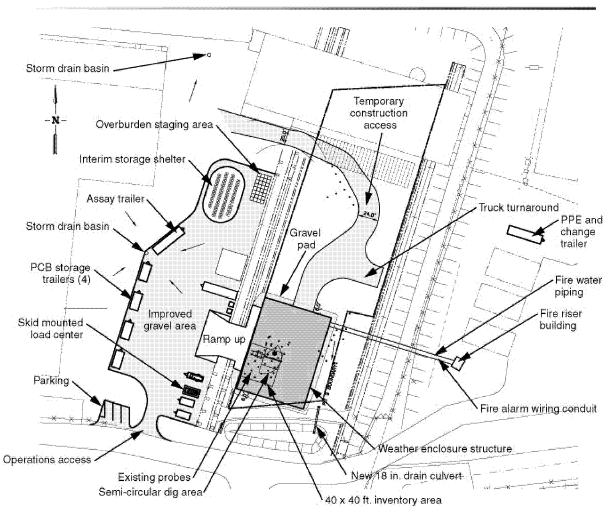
Plot plan of Pit 9 area showing project site improvements.
